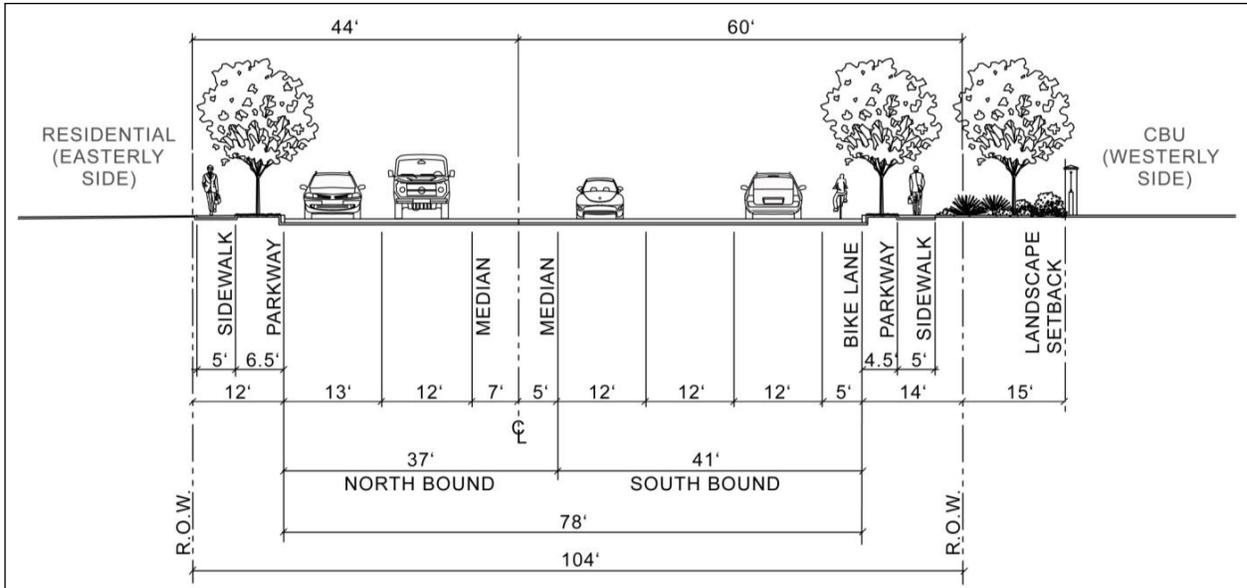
ADAMS STREET MODIFIED 104-FOOT ARTERIAL (LANCER LANE INTERSECTION)
